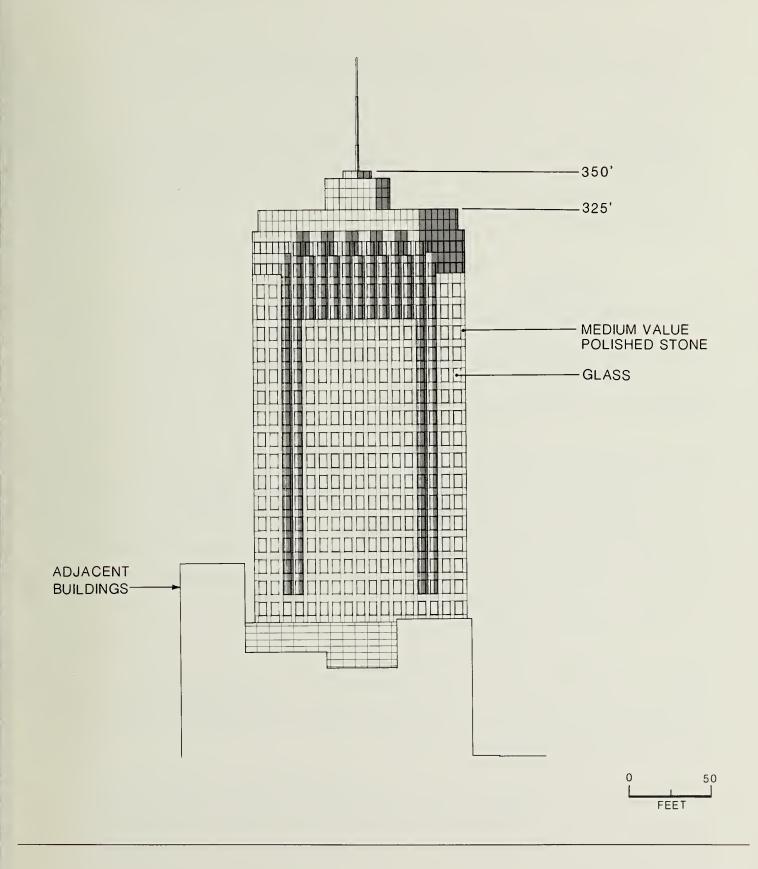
235 PINE BATTERY STREET ELEVATION
